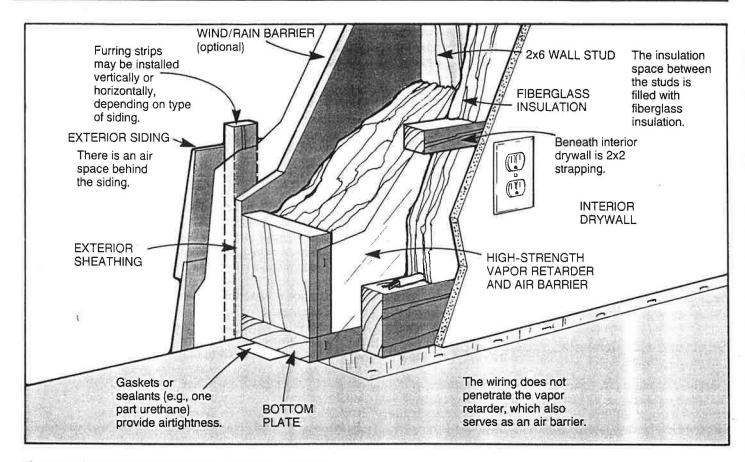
Cutaway of wall design for cold climates (new construction) using the Strapped 2x6 Approach. For additional details, see the Iowa DNR (1987) reference.
